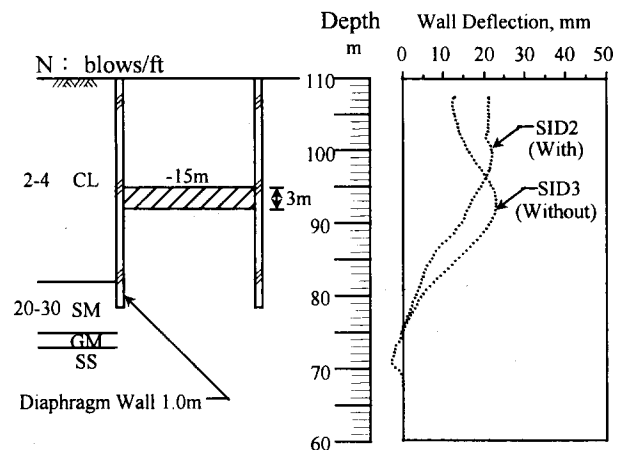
Wall Deflections - Job 9 With and Without Cross Beams
